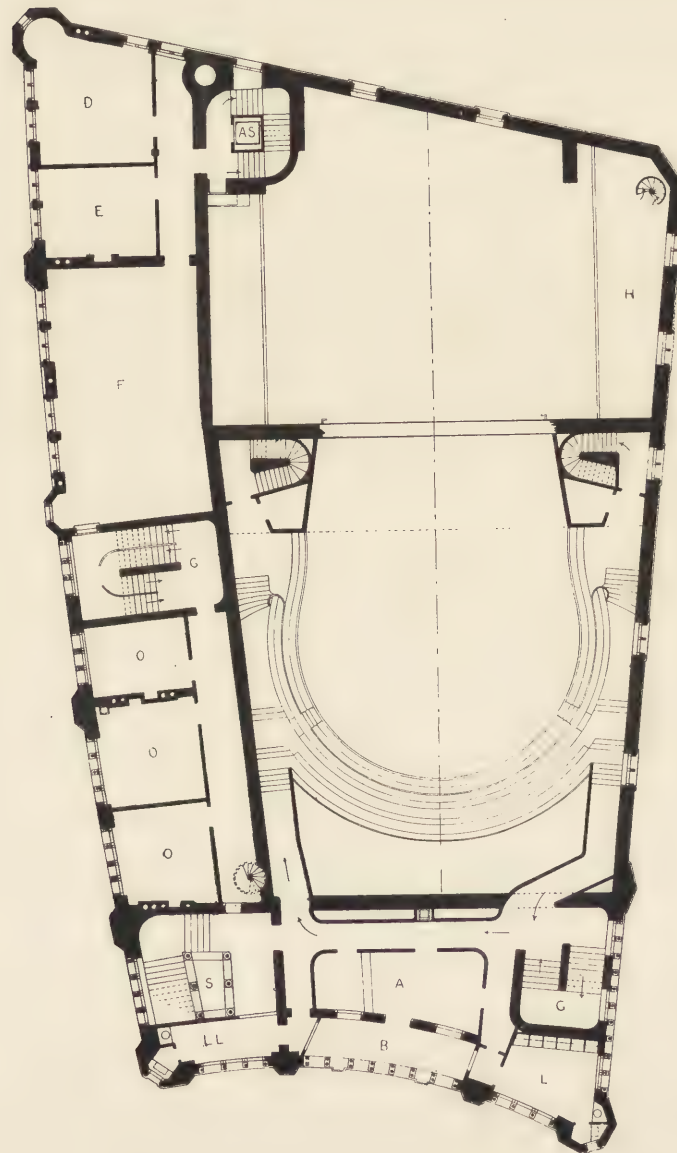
PLAN OF THIRD FLOOR (AMPHITHEATRE).
